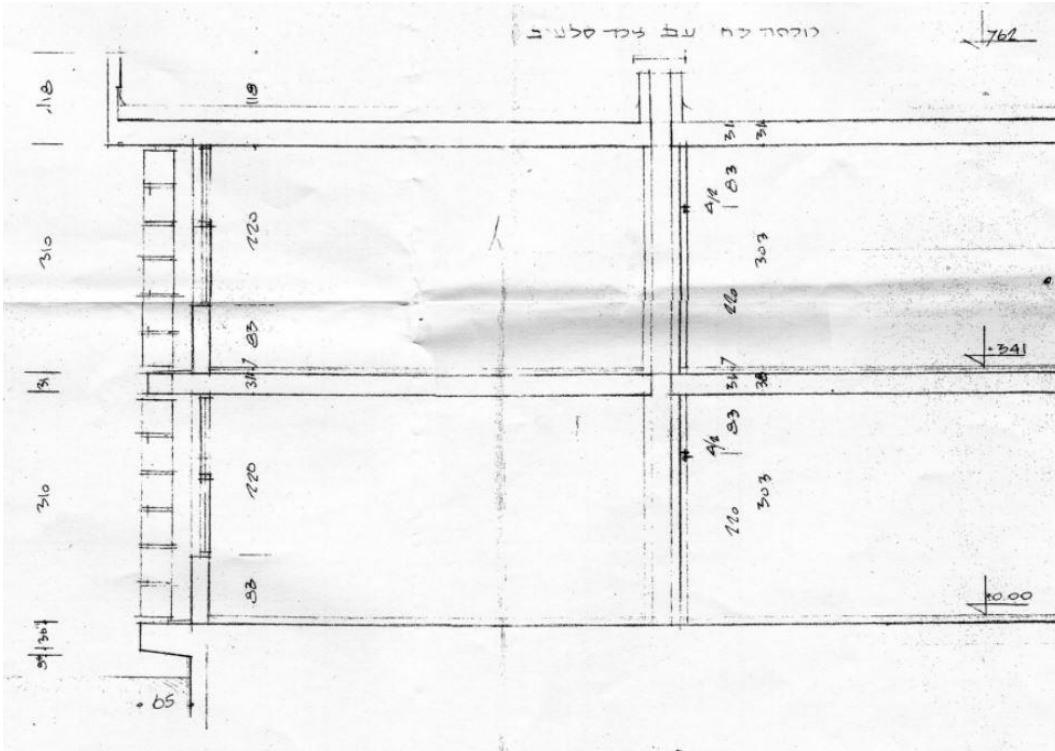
Gilman Building, original architectural plans, a detail of an east-west cross section of the southern wing showing a section through the peripheral rooms and the corridor
